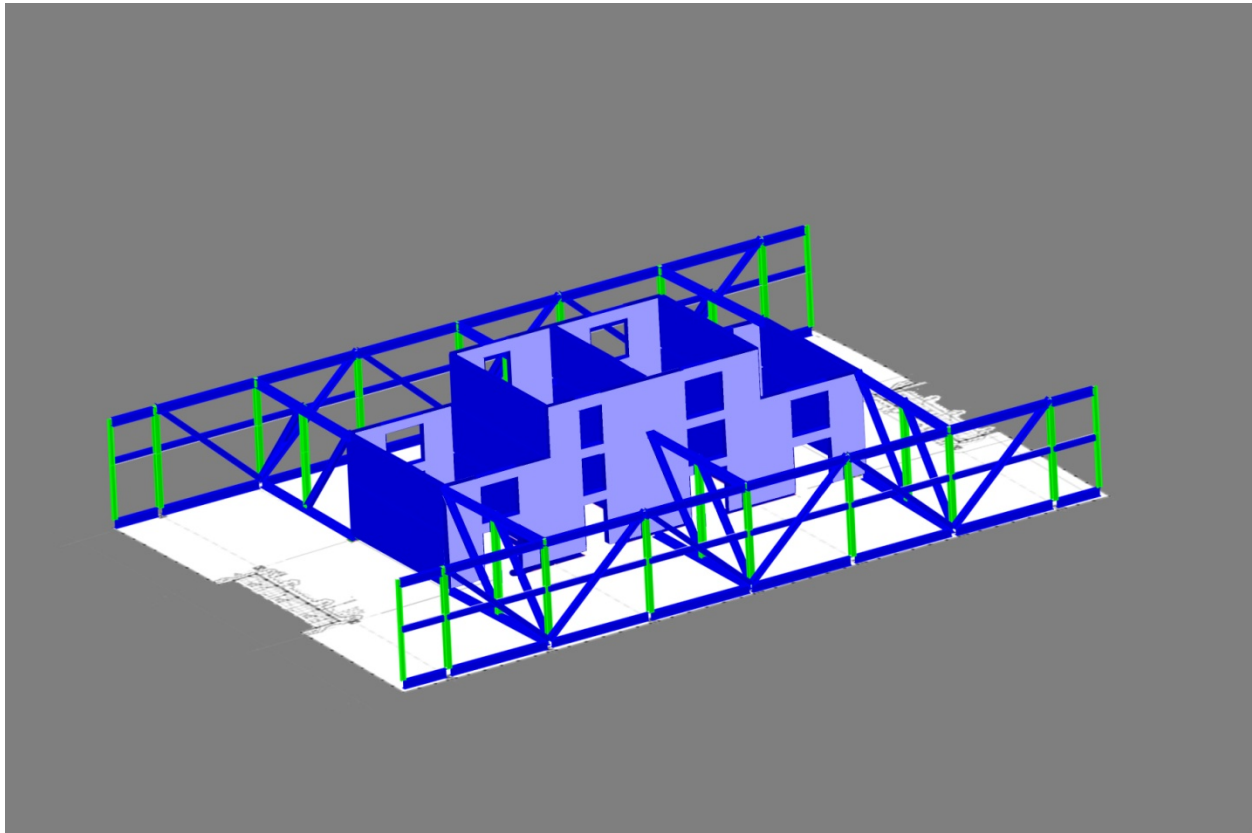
Outrigger and Belt Truss Location and Configuration as well as core step-back at Level 43
